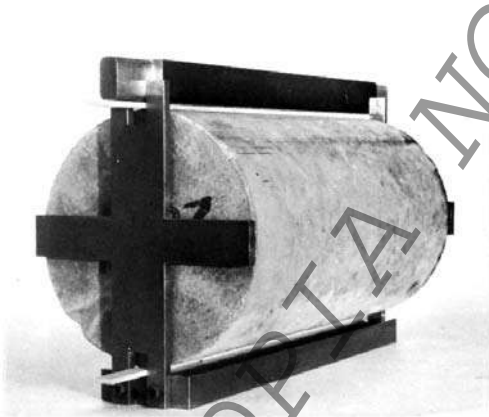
Jig for Aligning Concrete Cylinder and Bearing Strips
